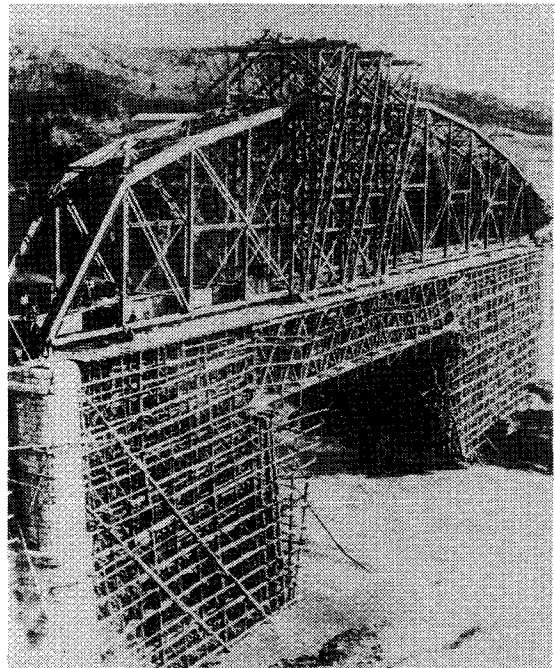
Construction of No.1 Kiso River Bridge (Completed in 1908)
